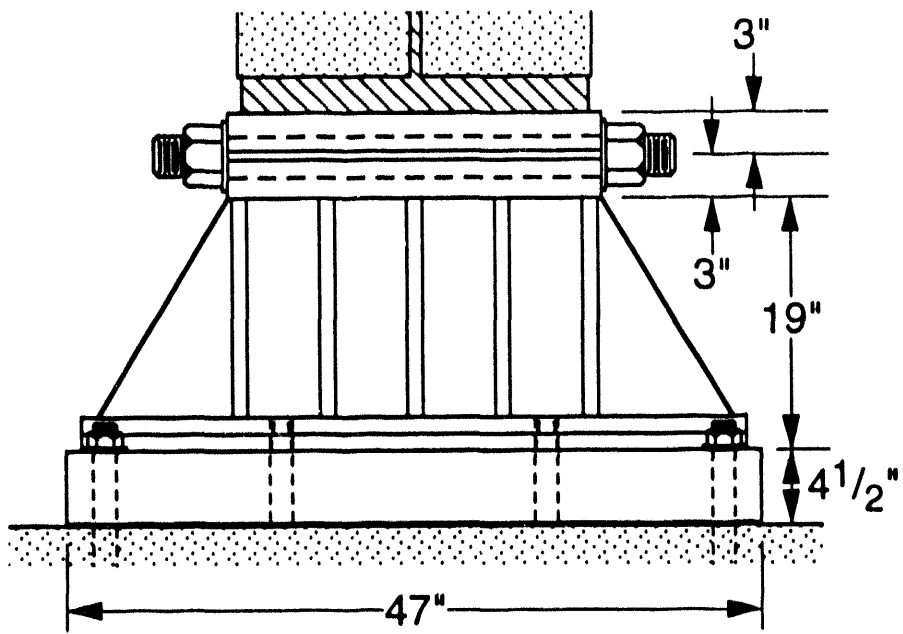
Connection detail found at piers 1 and 4 that allows longitudinal displacement.
